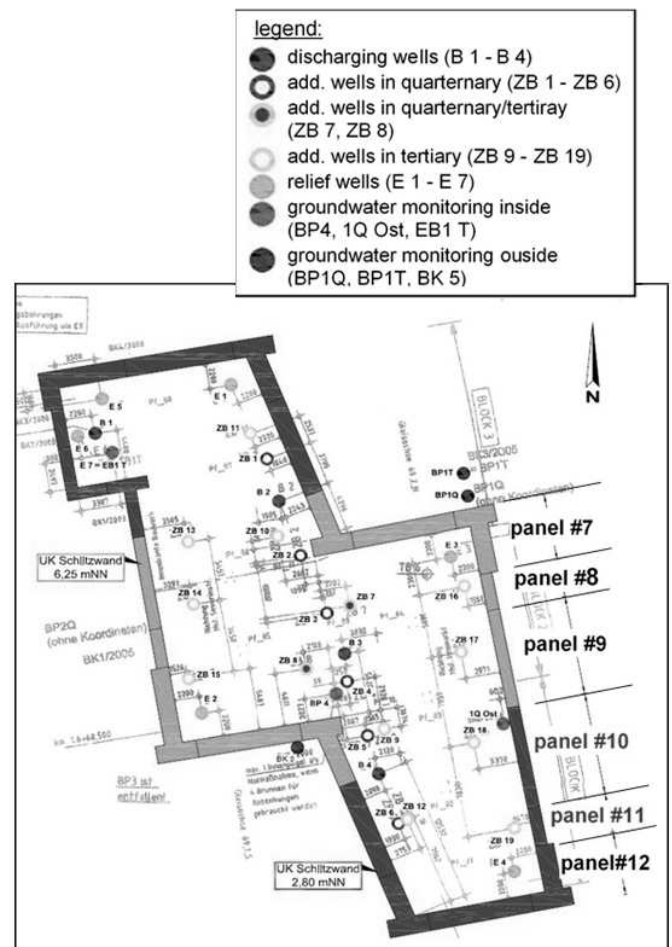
Ground plan of the excavation pit 'GWB' with diaphragm wall panels and groundwater discharging and relief wells; status before collapse in March 2009.
